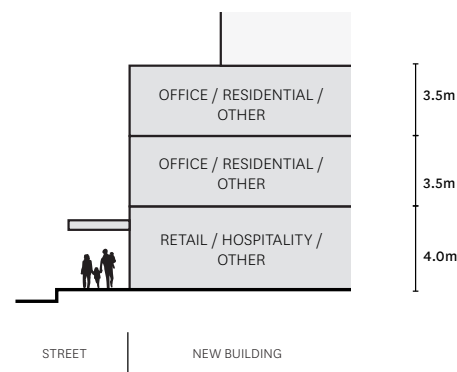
Diagram showing the minimum floor to floor heights for the street wall / podium levels of buildings.
